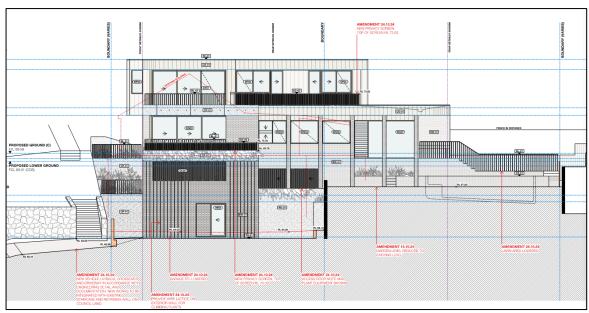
Extract of proposed northwest elevation (rear) (Source: Baikie Corr Architecture and Interiors)
